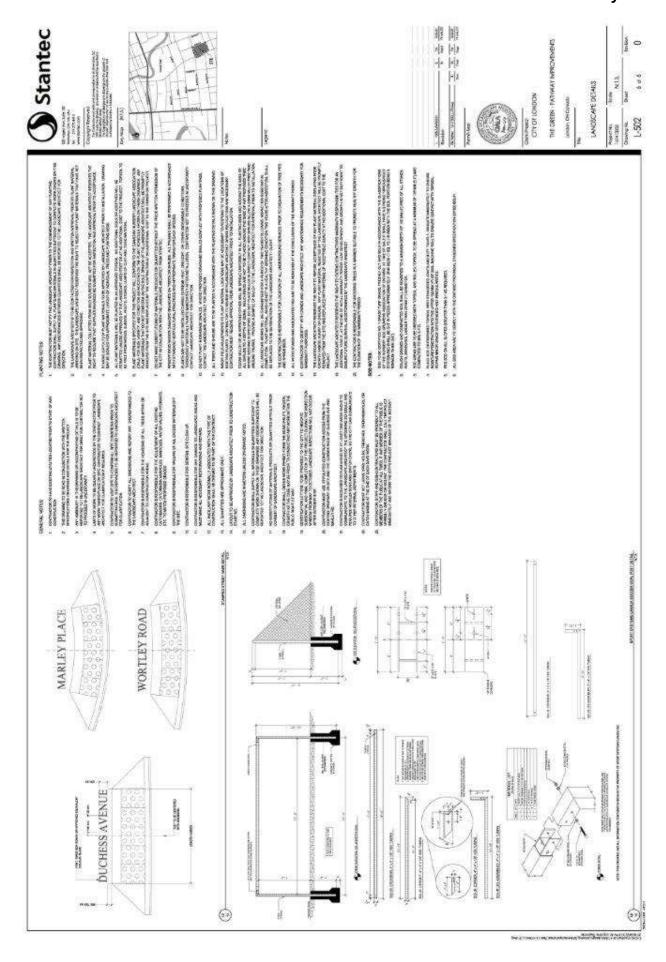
Drawing L-502: Landscape Details (April 2, 2018).
